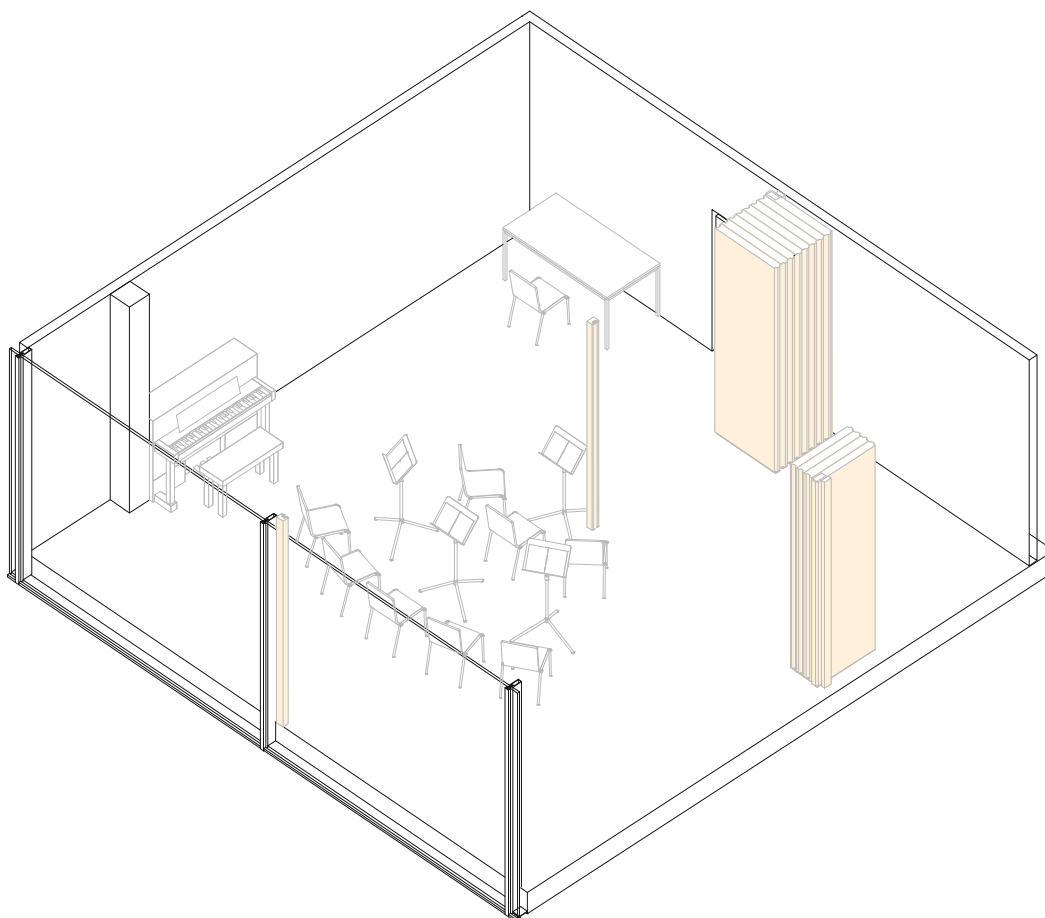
Flexible classrooms with open moveable walls- axonometry
